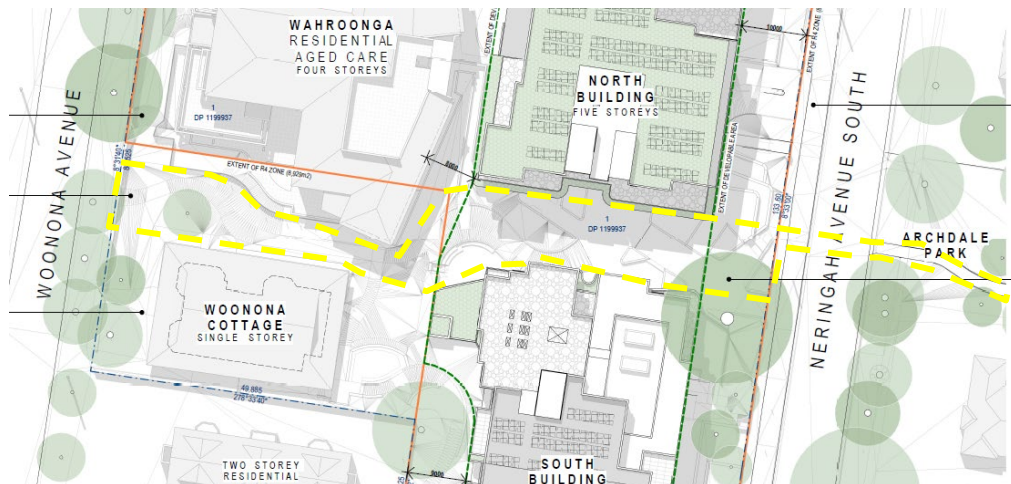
A portion of the proposed site plan, showing the through site pedestrian link running east-west through the site, outlined in yellow. (Source: Bickerton Masters Architecture)
